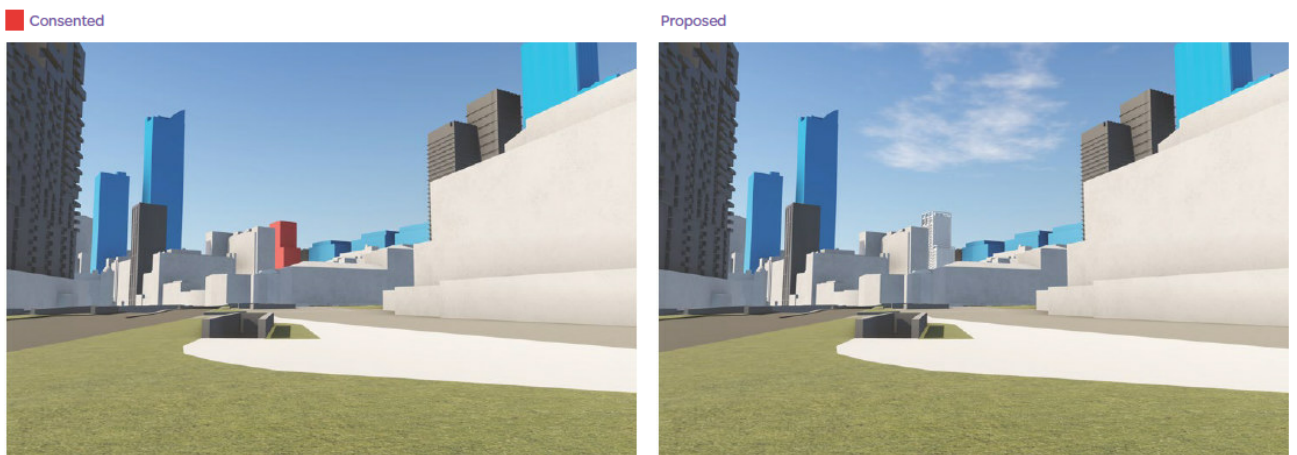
Consented and proposed representative view from junction of A232 Croydon Flyout with Park Lane (adjacent to the eastern side of Queens Gardens)
